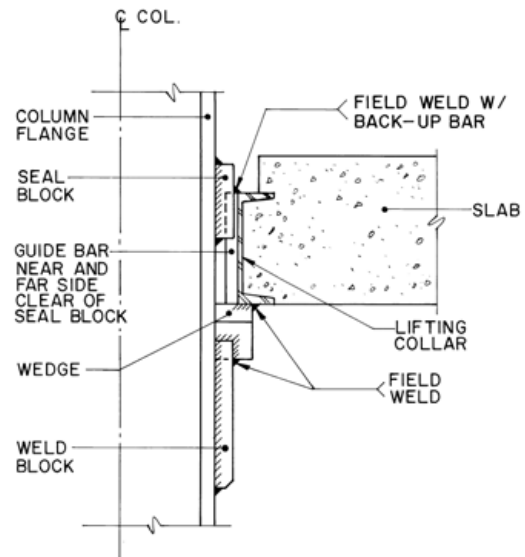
Section through lifting collar and column flange showing connections of lifting collar to the column flange. Seal block was omitted at multi-story condominium buildings.
